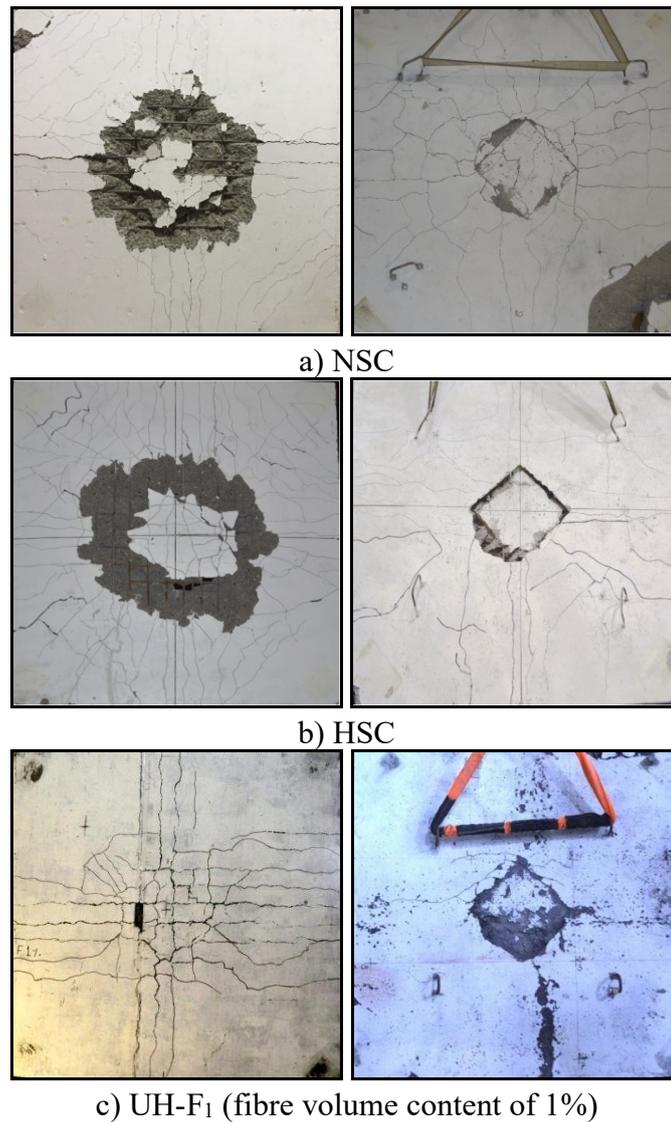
Final crack pattern of RC specimens (left: bottom surface; right: top surface)
